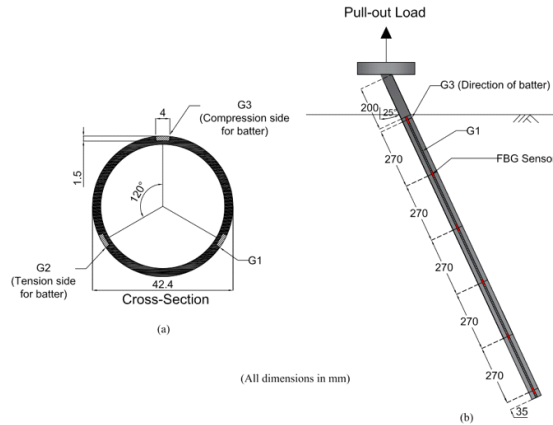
Dimension of grooves along test pile's shaft and layout of FBG sensors inside the pile: (a) Cross-section of pile and configuration of grooves; (b) layout of FBG sensors along battered mini pile length (Tsang et al. 2020a).
